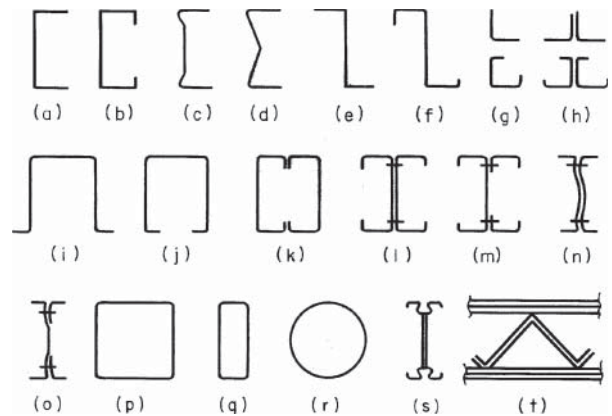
Cold-formed sections used in structural framing.^{1.6}
